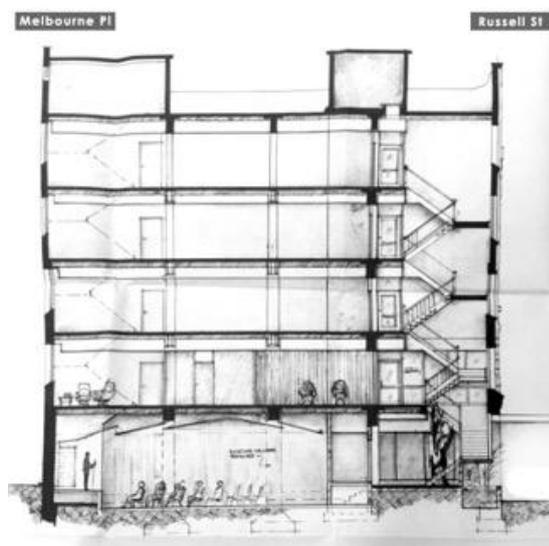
Section drawn by Meldrum Burrows & Partners in 1972. The floor level in the ground floor auditorium was to be lowered and sloped. (PROV Public Building Plan VPRS8044/P/3)
